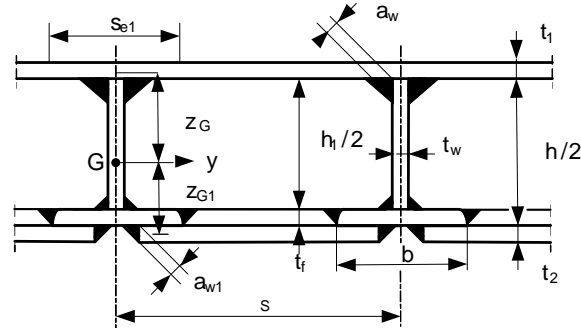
A cantilever square box column with cellular plated walls and the welded corner
